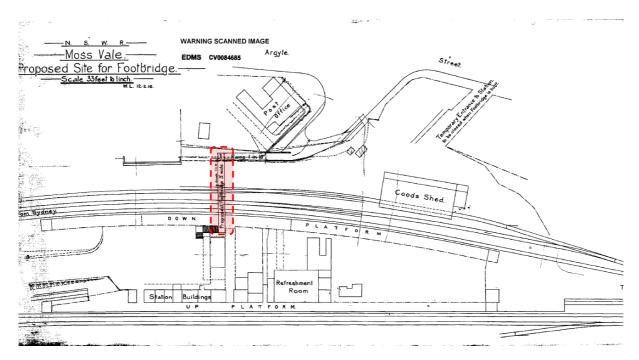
Plan of the station layout in 1916 showing the Argyle Street footbridge as 'proposed' (highlighted in red). (Source: CMP 2020)
